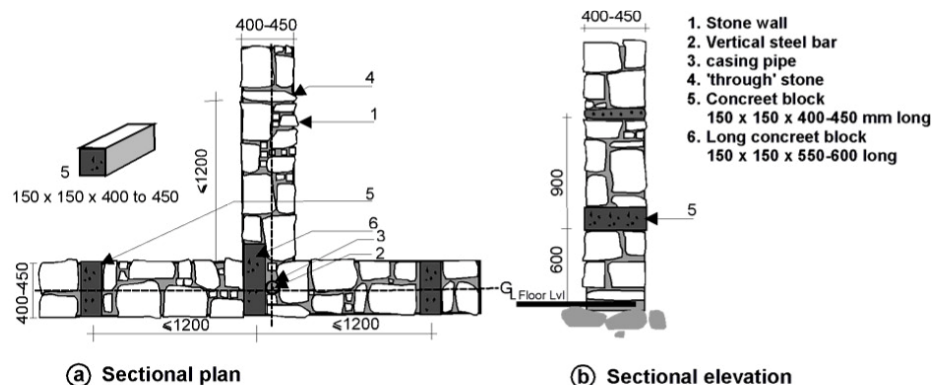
'Through' stone or bond elements in stone wall built in mud mortar
